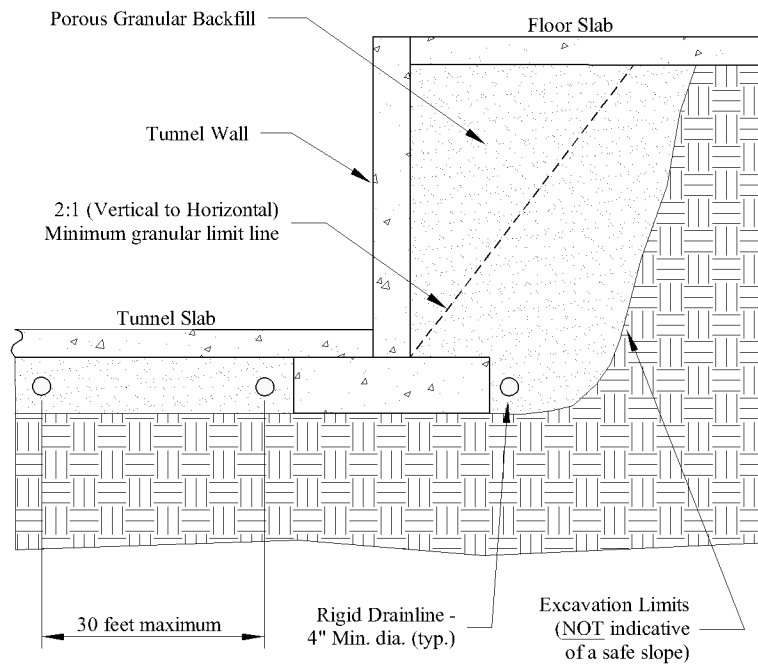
Typical Lateral Earth Pressure Section for Below Grade Tunnels
